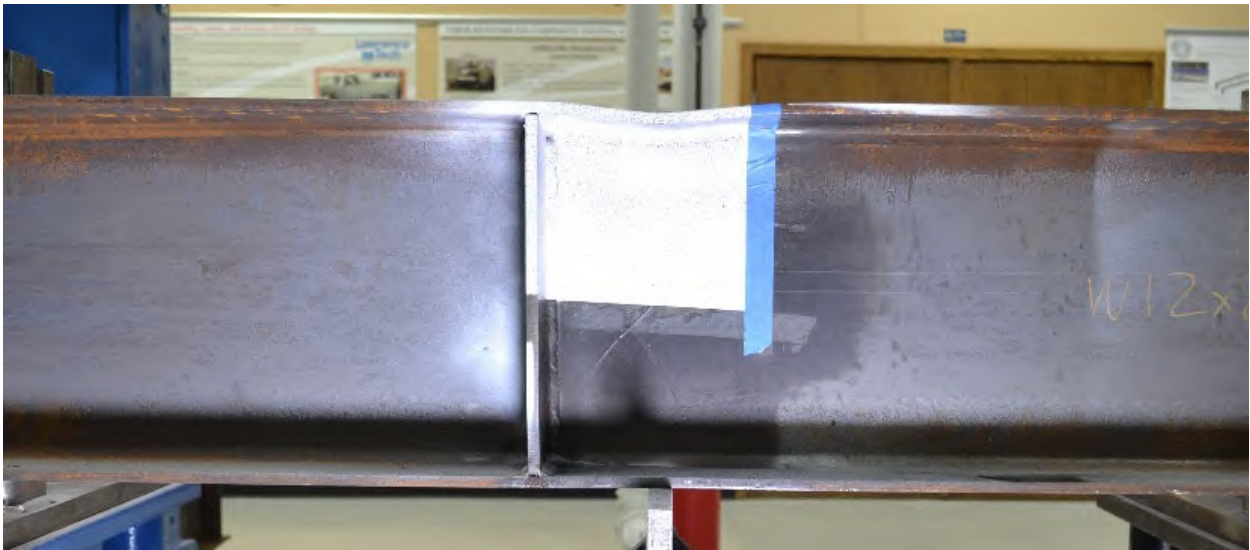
Close-up view of W12X26-DC-NA after testing
